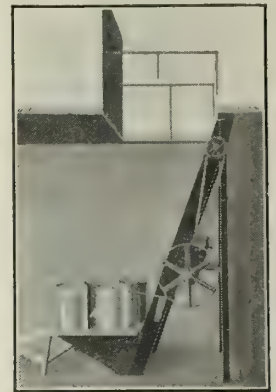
Platform without Pit Only 18 in. from Cellar Floor Shown with Ernst safety guarded door
